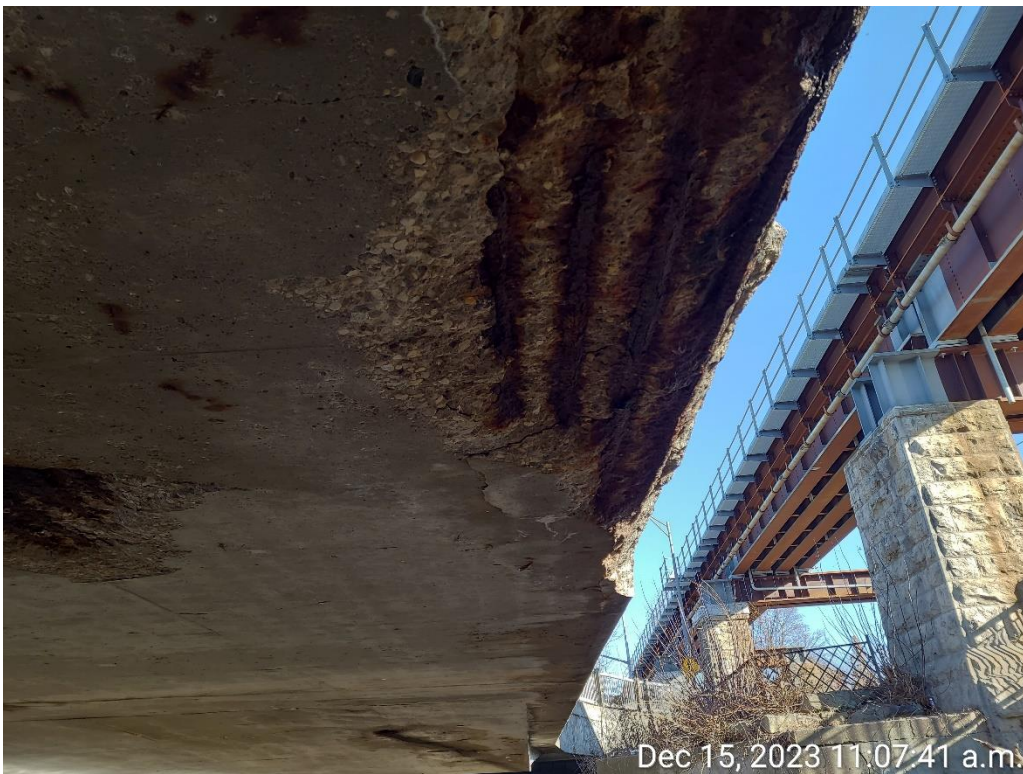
South fascia showing severe spalls and exposed corroded rebar
